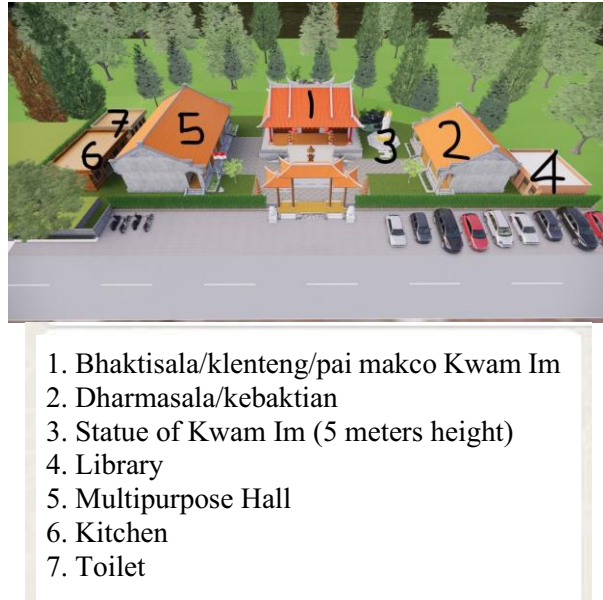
The buildings' program plan. (Source: Authors, 2023)
